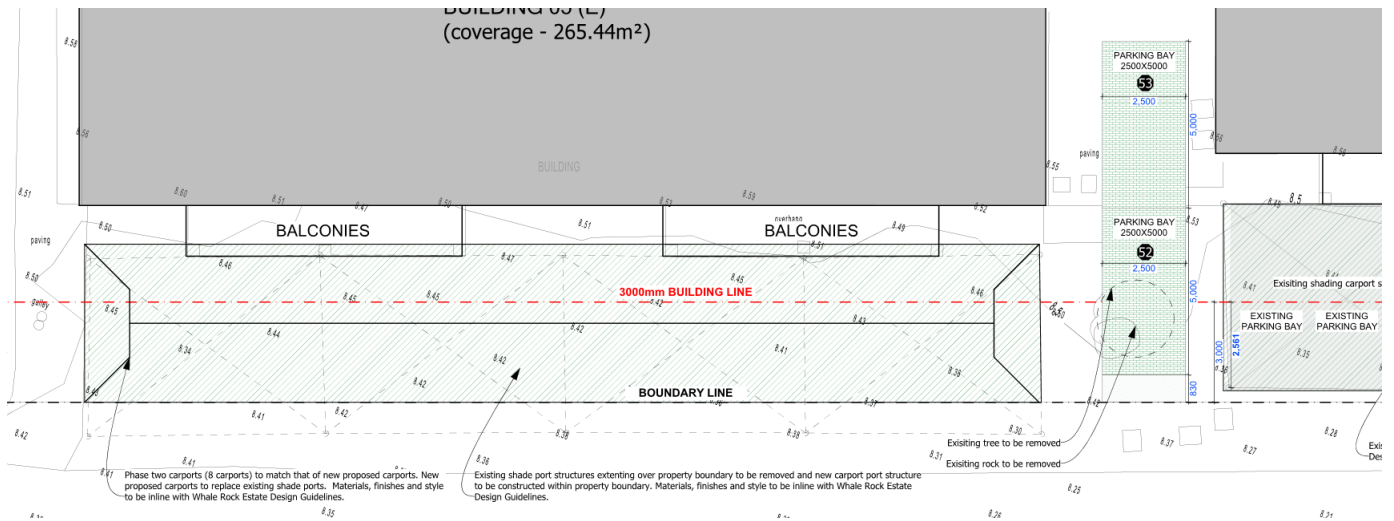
Site and ground plan indicating eight (8) new carports and one (1) new shadeport encroaching the southern perimeter building line in front and adjacent to building no. 5 (E)
